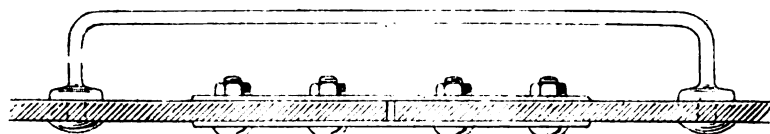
Bond Wire with Shoulder Riveted in one piece.
